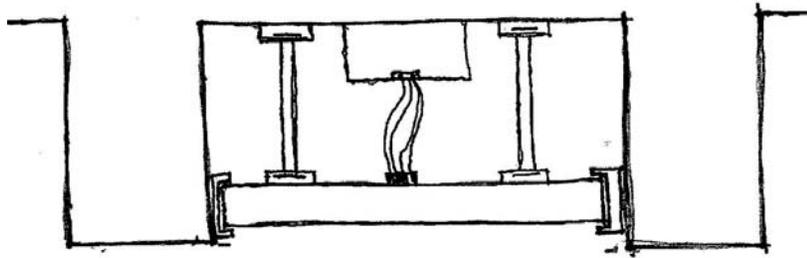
(Faulkner) LED Ceiling Section Detail Sketch
